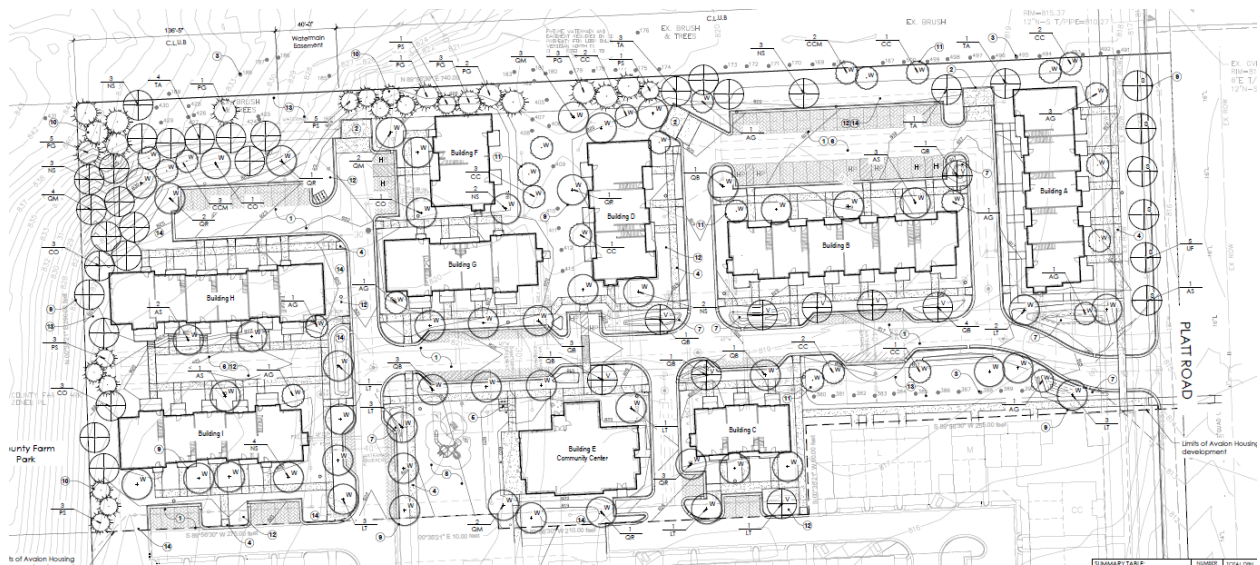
North Site Plan (Avalon) with Landscape Notes
